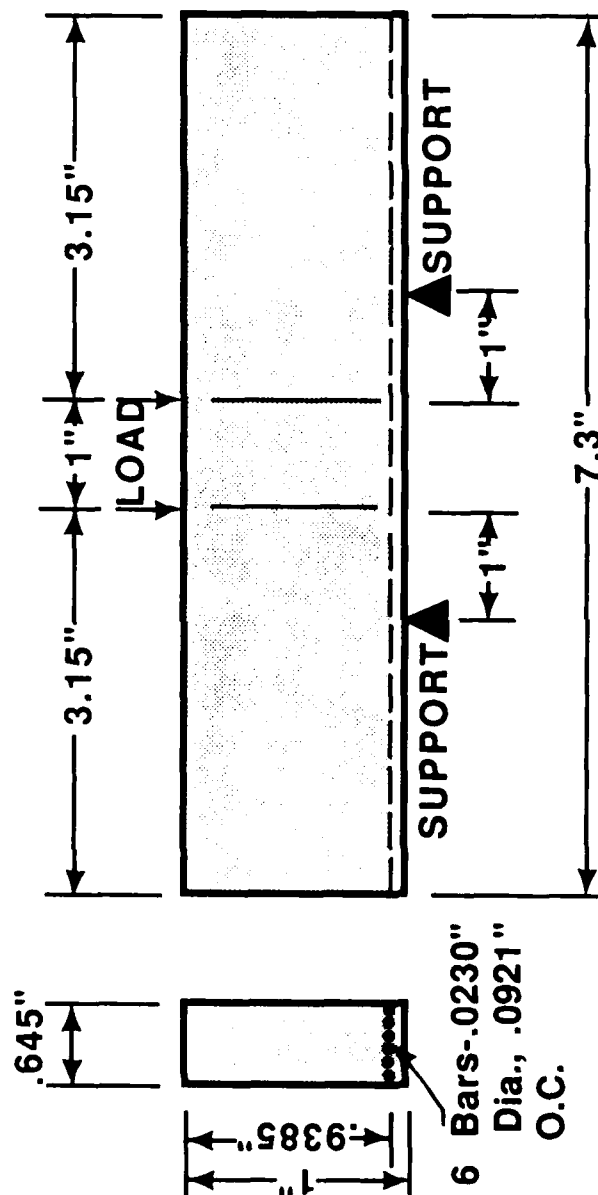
Schematic of Beam, and Location of Loading and Supports used in Beam Tests
